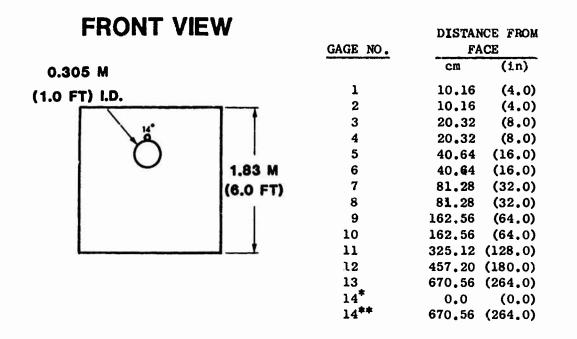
Pressure gage arrangement in long straight tunnel, 1982 test series.
